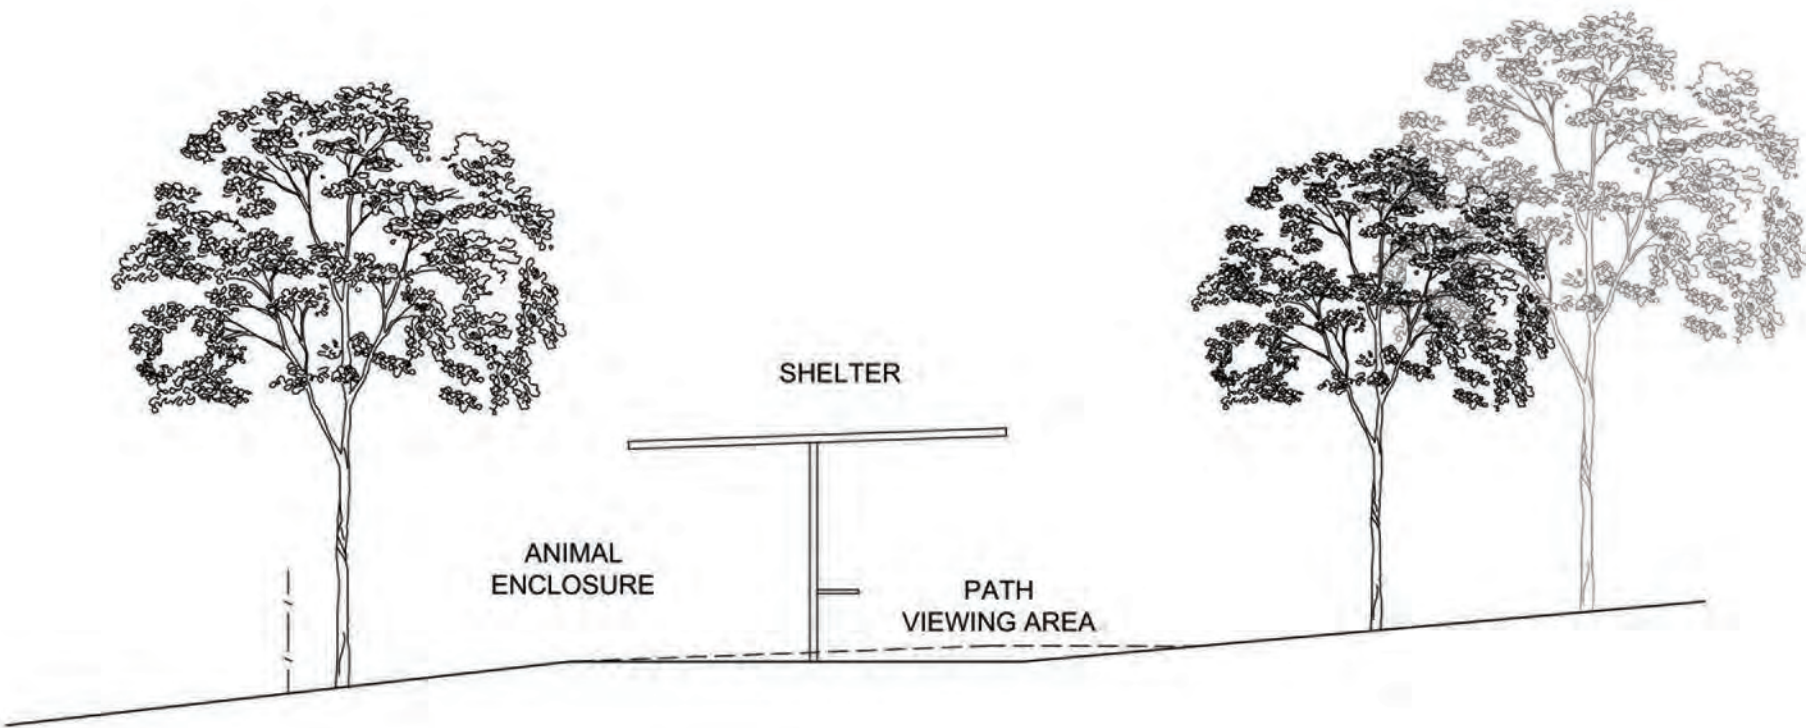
CENTRAL SECTION OF THE SITE
